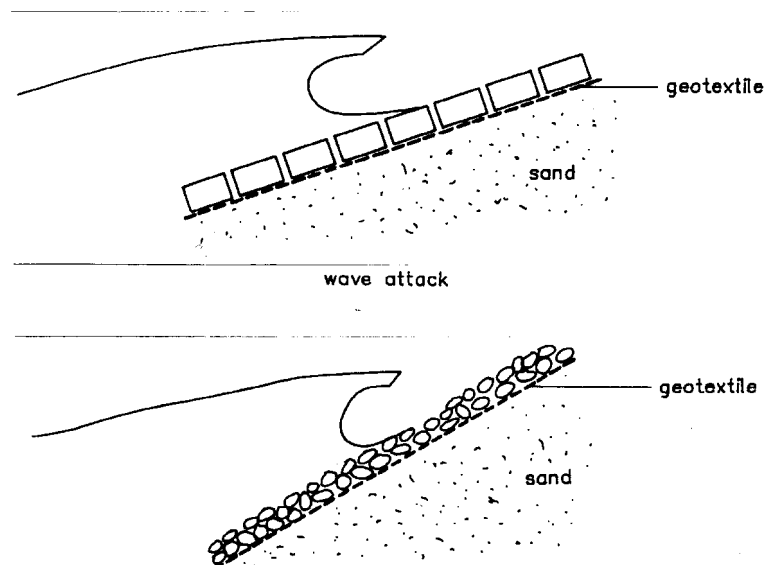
Examples of structures in which geometrically sandtight geotextiles are necessary
